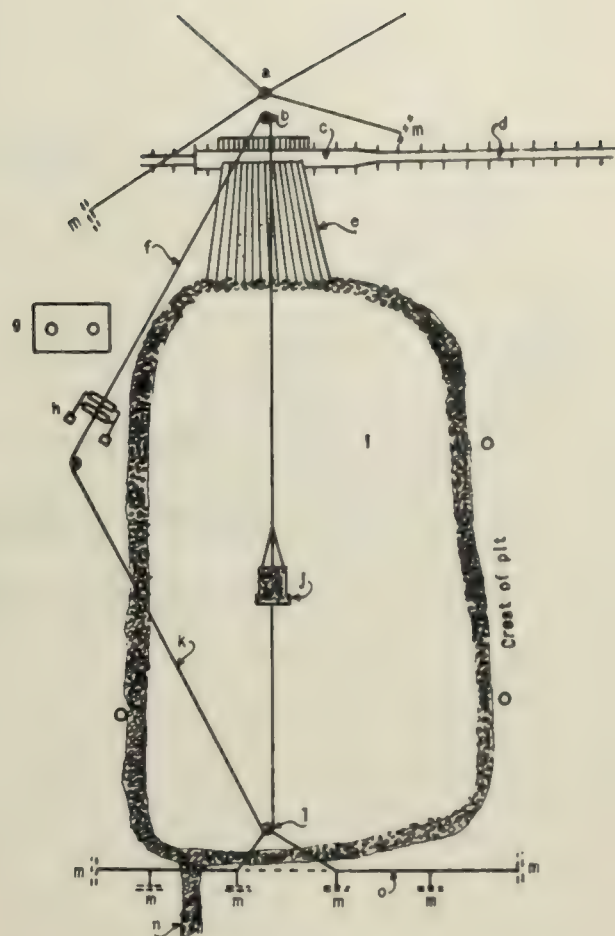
Typical slip-scraper arrangement (after Wimmer):
